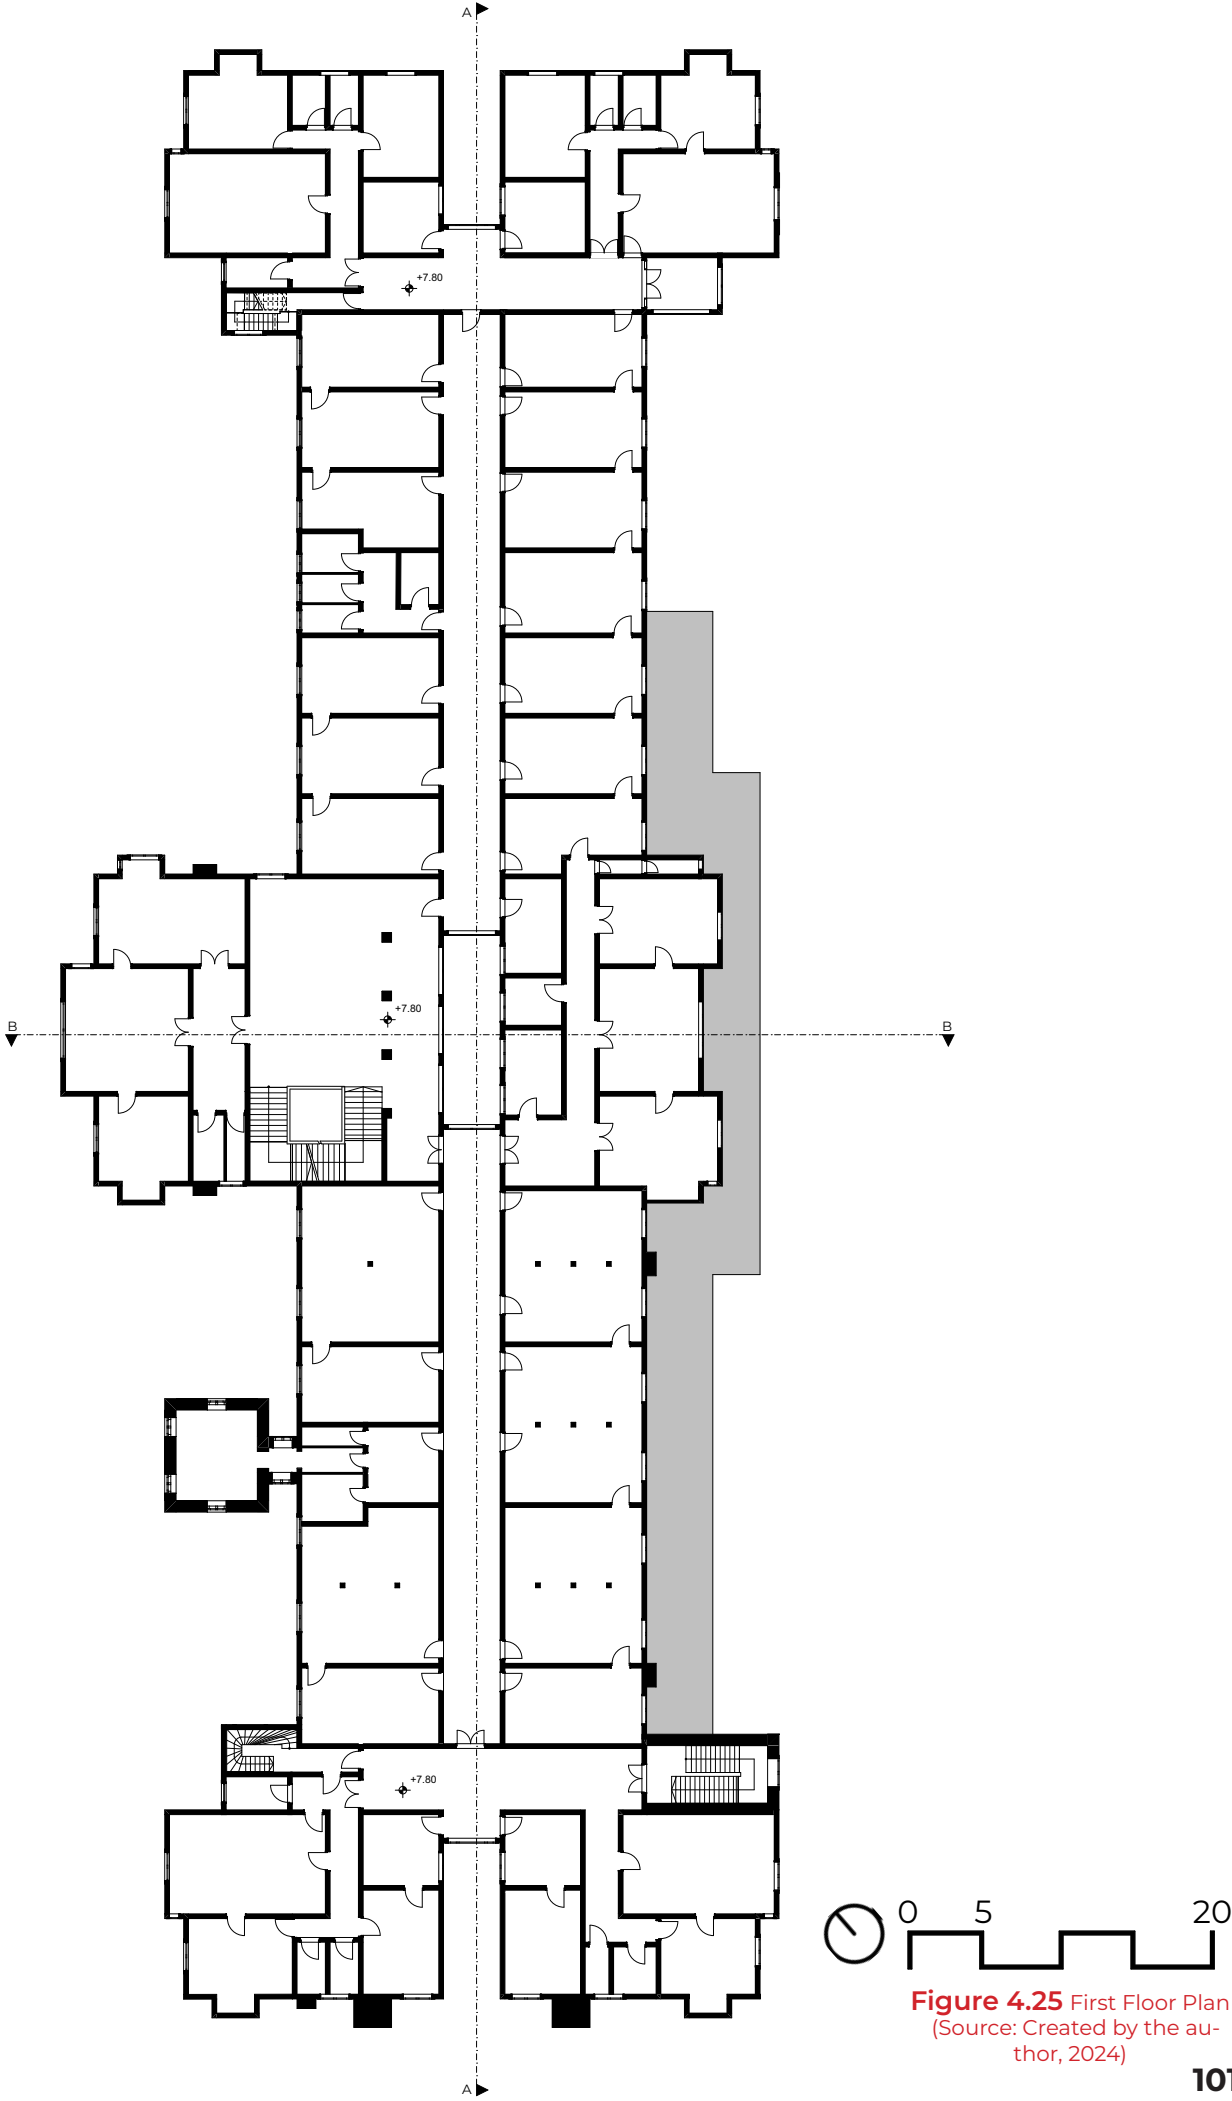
First Floor Plan (Source: Created by the author, 2024)
